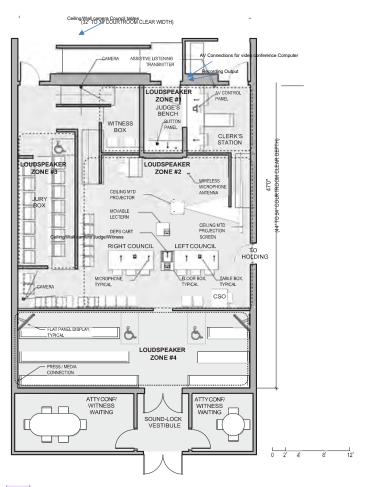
Typical Courtroom, Center Bench—A/V Requirement
